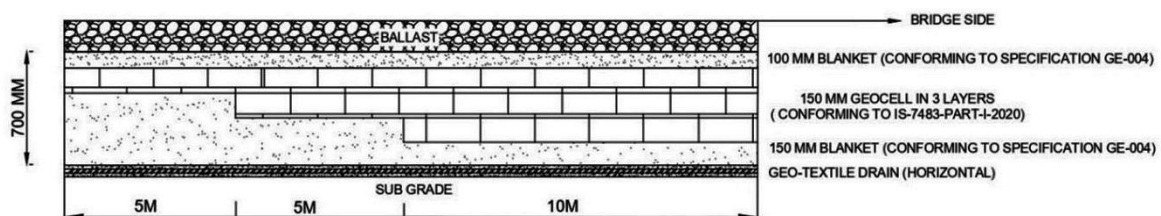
Section for trial stretch recommended by IIT Madras (Prof K Rajagopal)
